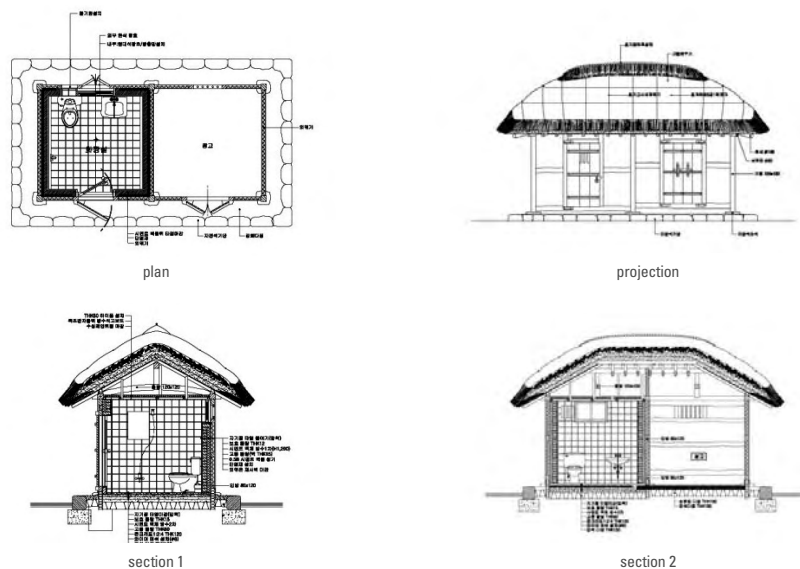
Design Guidelines for Modification of Layout and Structure (new construction of bathroom as a straw-thatched annex)
